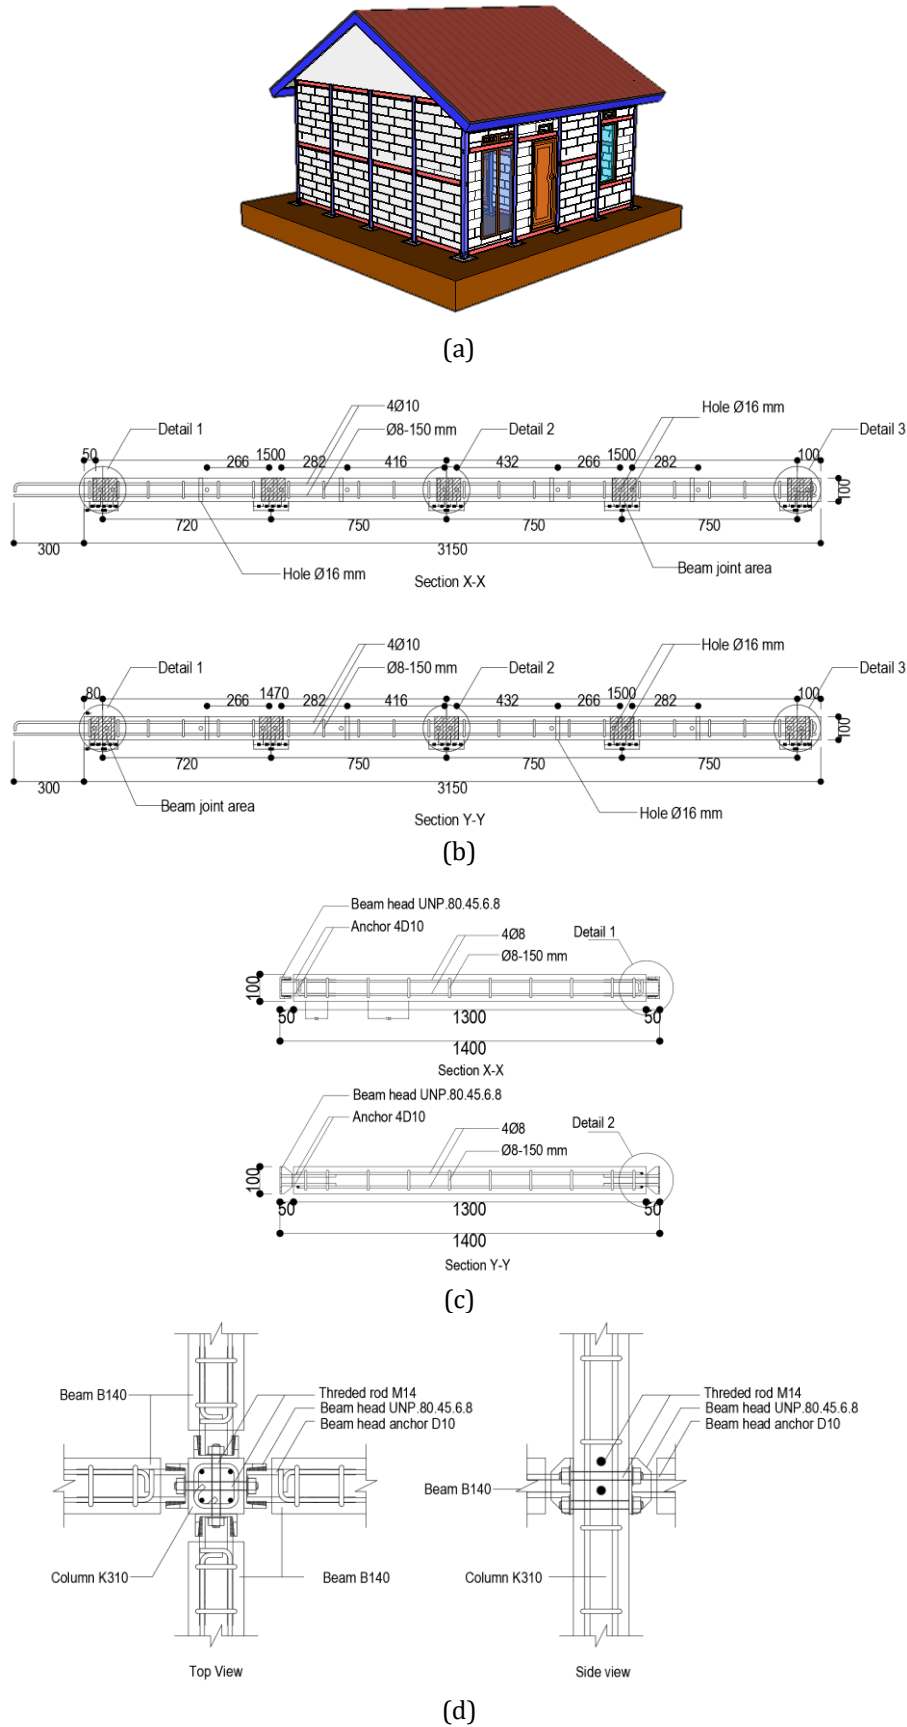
Sketch of The RUCAST Unit and Confining Element Components (a) Building Unit (b) K315 Column (c) B140 Beam (d) Beam-Column Connection System.
